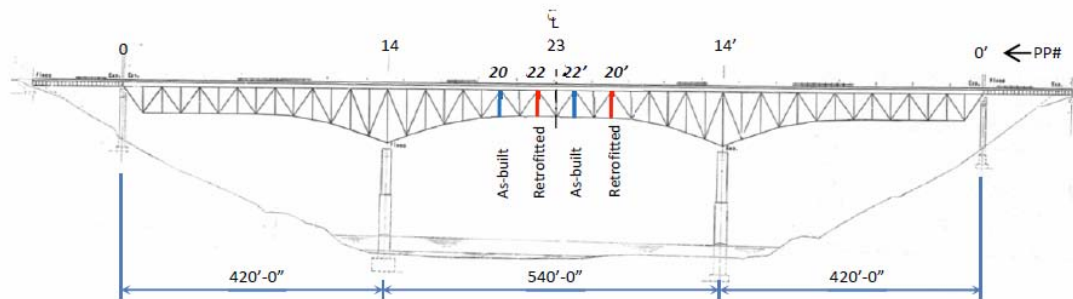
Side view of the truss bridge looking north (courtesy of Mr. Ian C. Hodgson)
